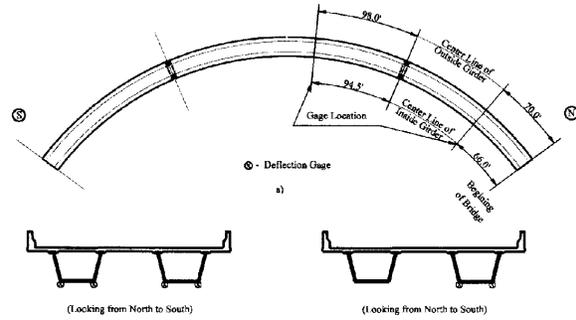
Locations of Vertical Deflection Gages, (a) plan, (b) Cross-section of Side Span, (c) Cross-section of Center spans.
